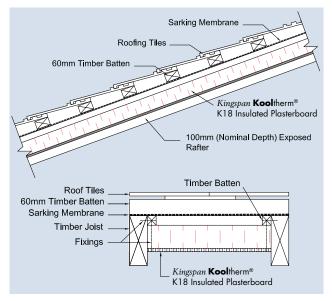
Side and front elevation - Raked ceiling (exposed beam) with Kingspan Kingspan Kooltherm® K18 Insulated Plasterboard
